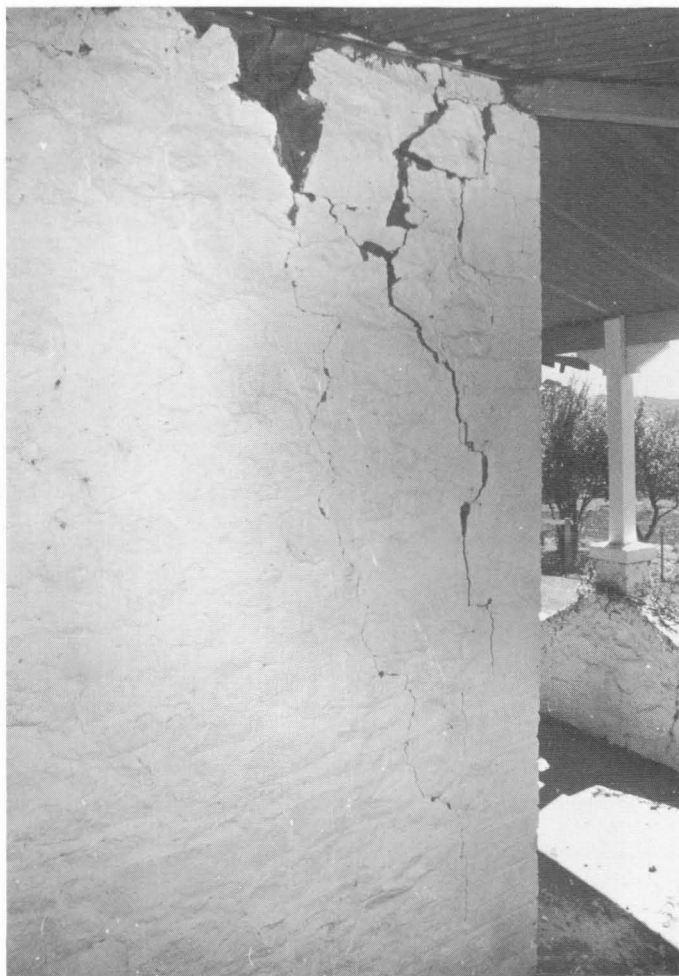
Extensive corner cracking, spalling of mortar.
